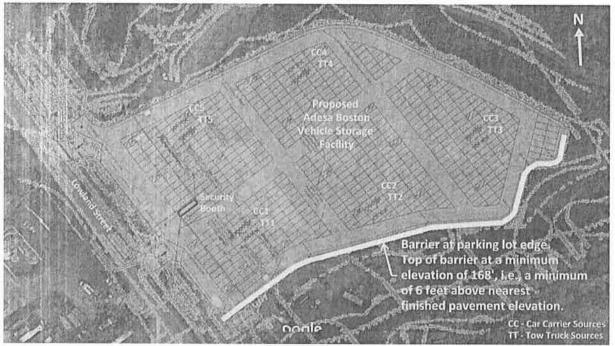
Sound control barrier along southeast pavement edge, with its top-edge at a minimum elevation of 168' i.e., extending a minimum of 6 feet above the nearest pavement elevation
